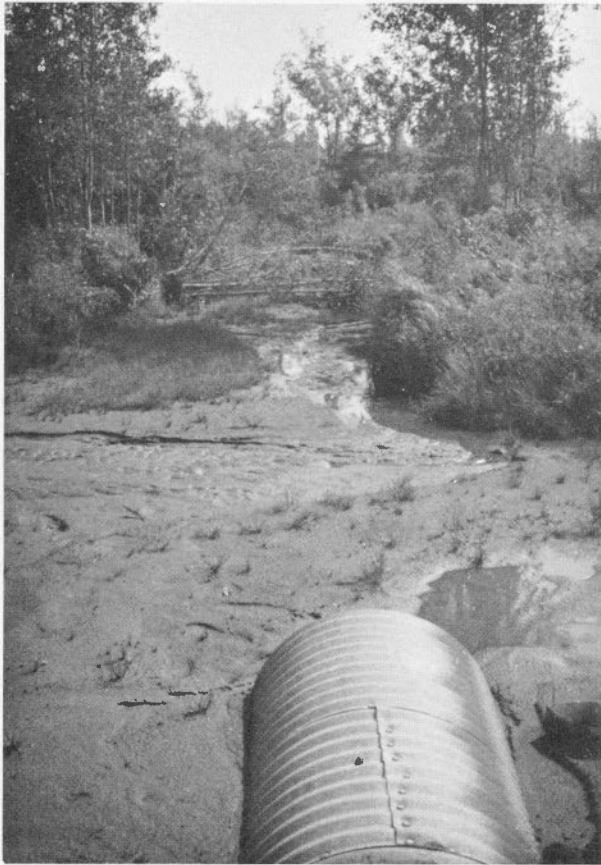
Western Road, western Prince County. Extensive accumulation of sediment at intersection with stream. Note degree to which road culvert has become embedded.
